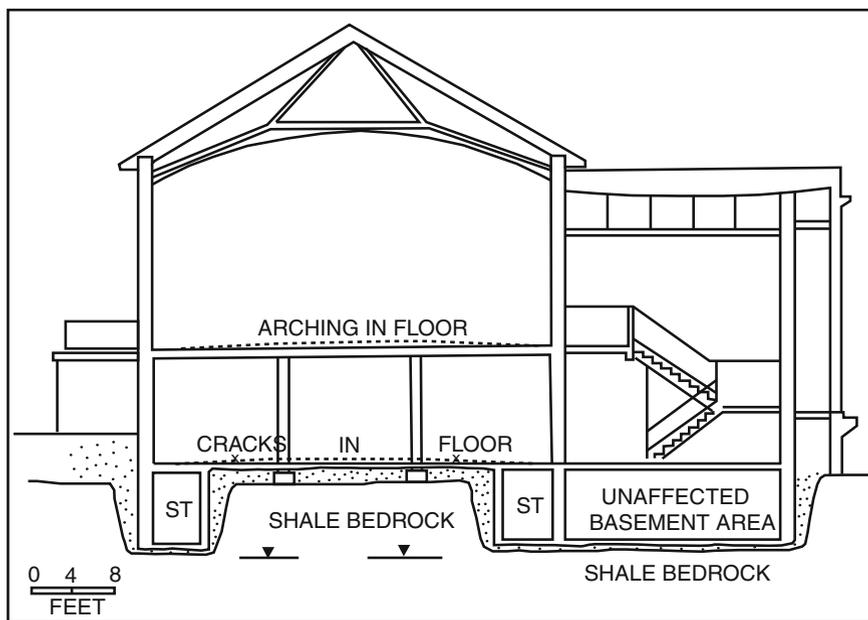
Cross-section of Rideau Veteran's Home illustrating heave in the ground and second floor slabs (from Quigley and Vogan 1969)
